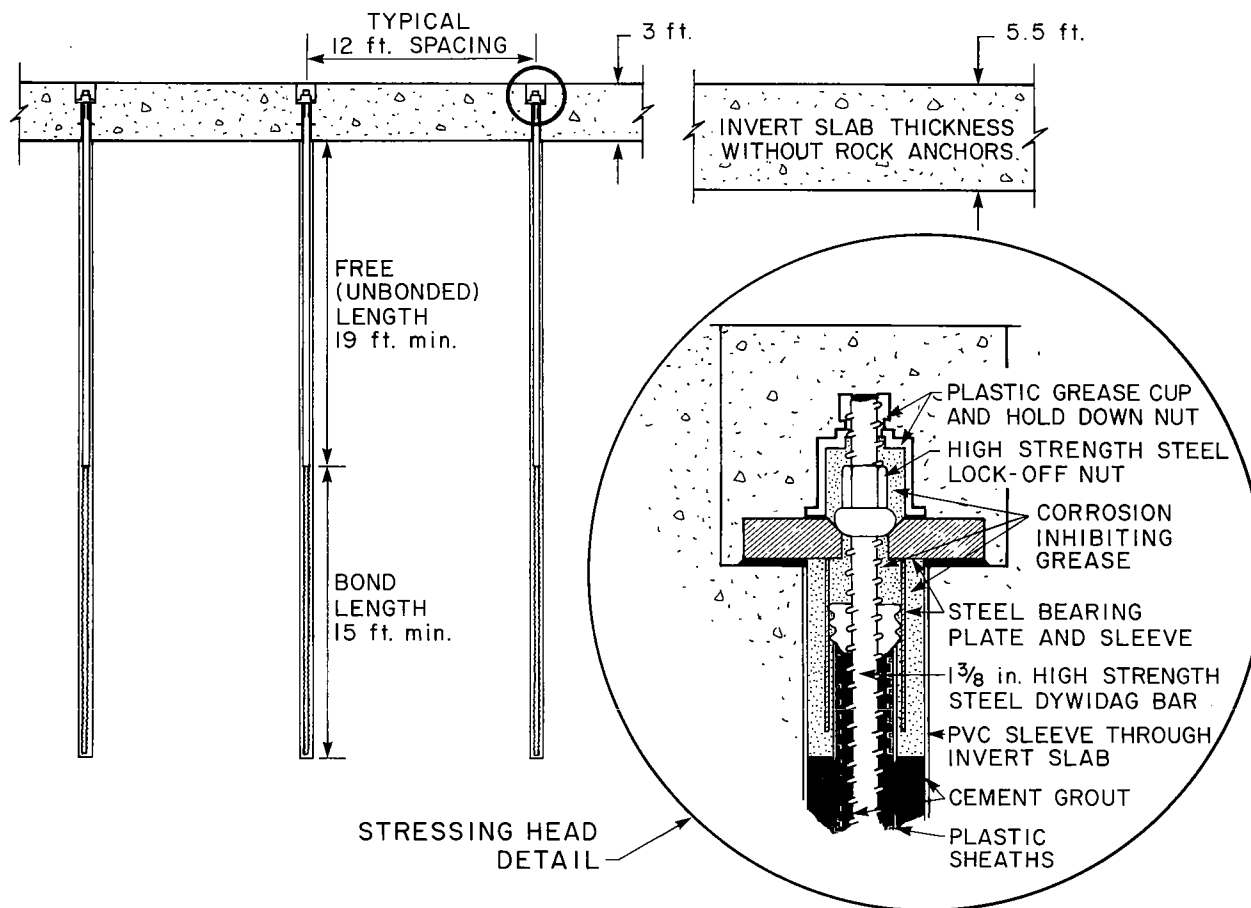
Typical Tiedown Rock Anchor Installation and Stressing Head Detail
